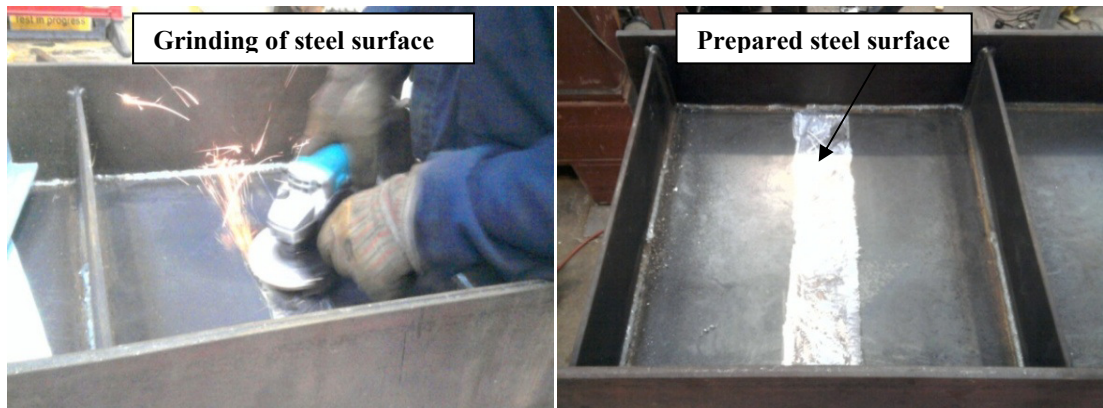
Grinding of steel surface and prepared steel surface for bonding GFRP pultruded section stiffener
